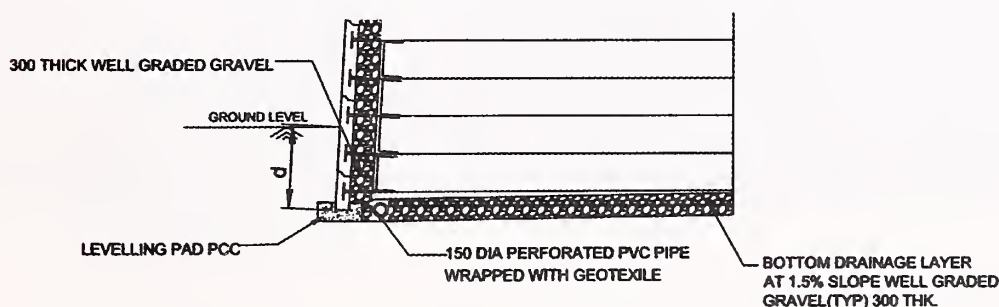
(a) Drainage of Reinforced Soil Wall/Slope
